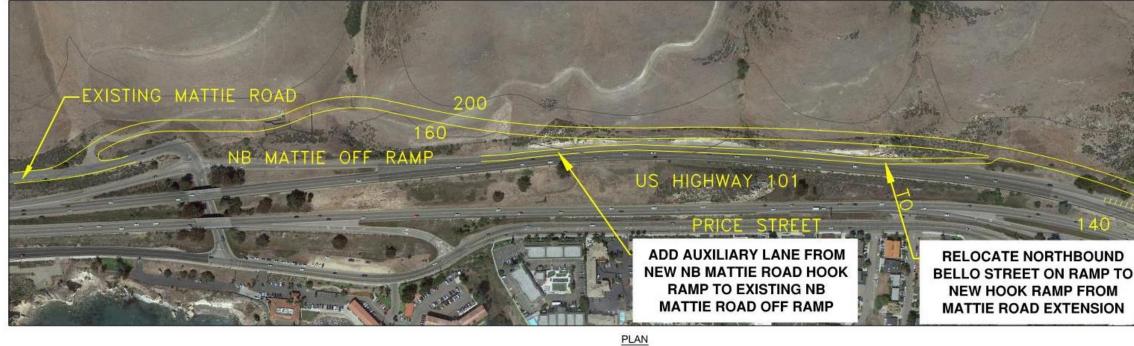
A – Mattie Road Extension Conceptual Plan/Profile
